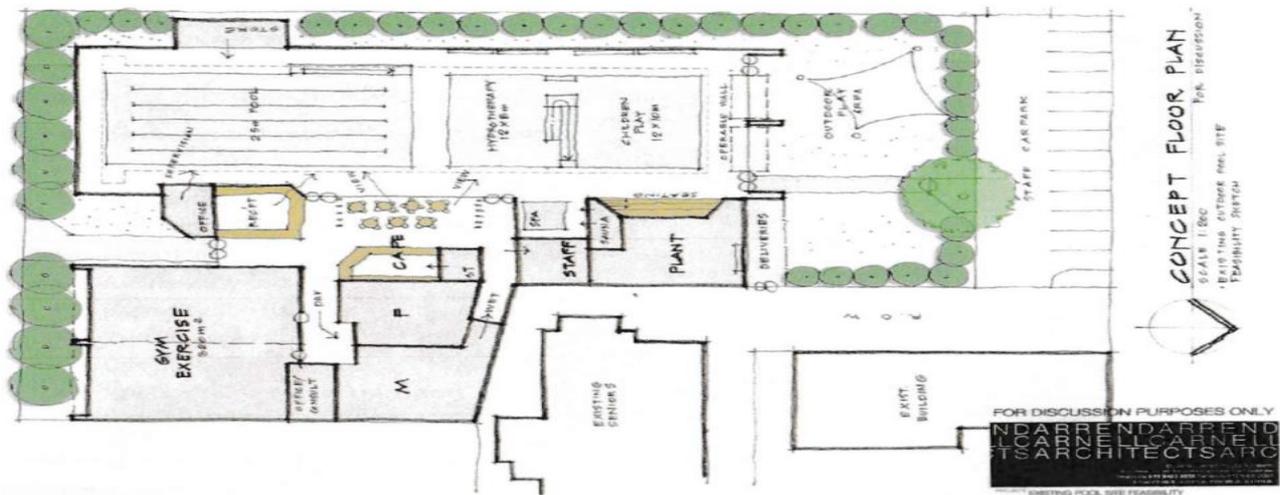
DIAC Advocacy Group - Concept Plan Existing Outdoor Pool Site
